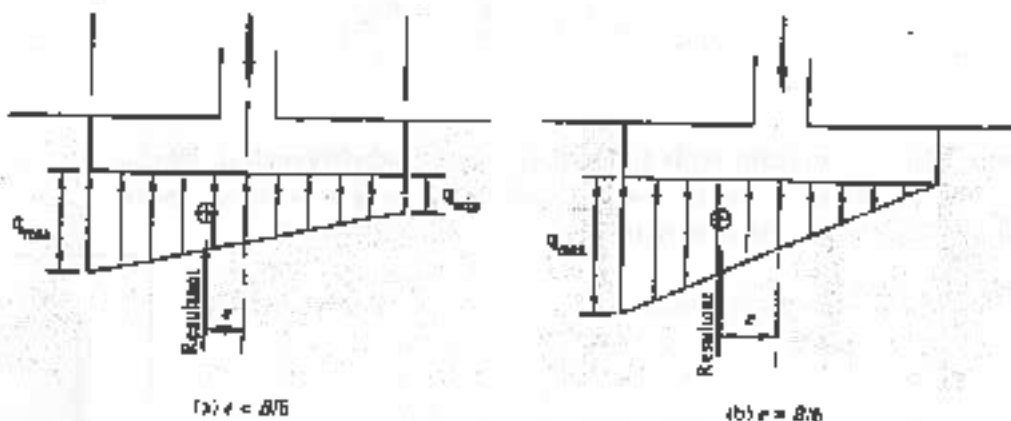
(a) Eccentric and (b) moment loads on shallow foundations.
